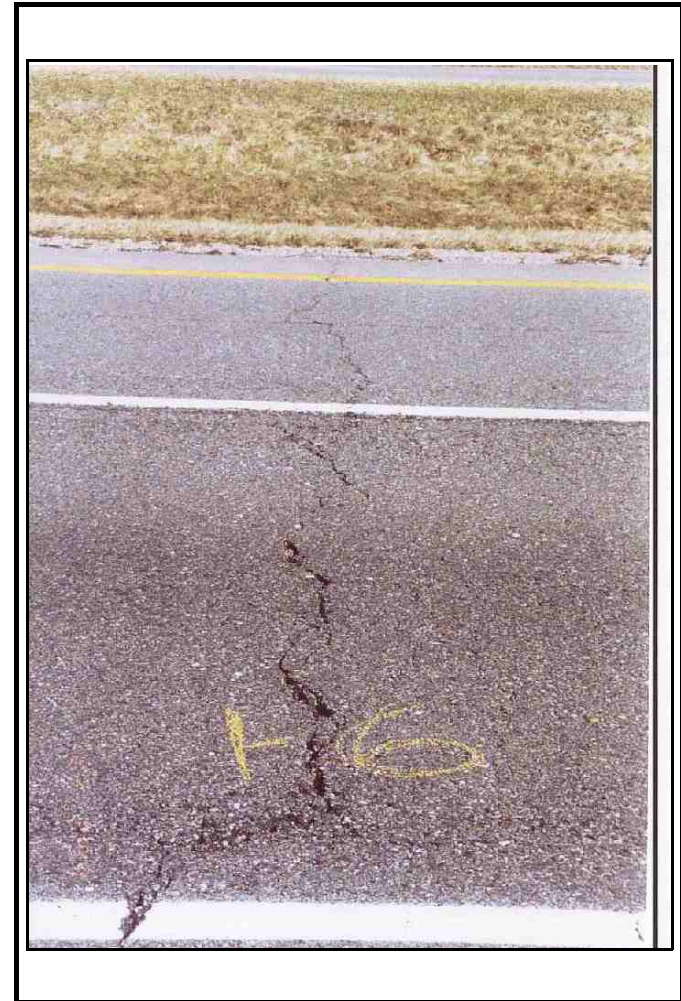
Unjointed Base, Transverse Cracking in Composite Pavement, High Severity
